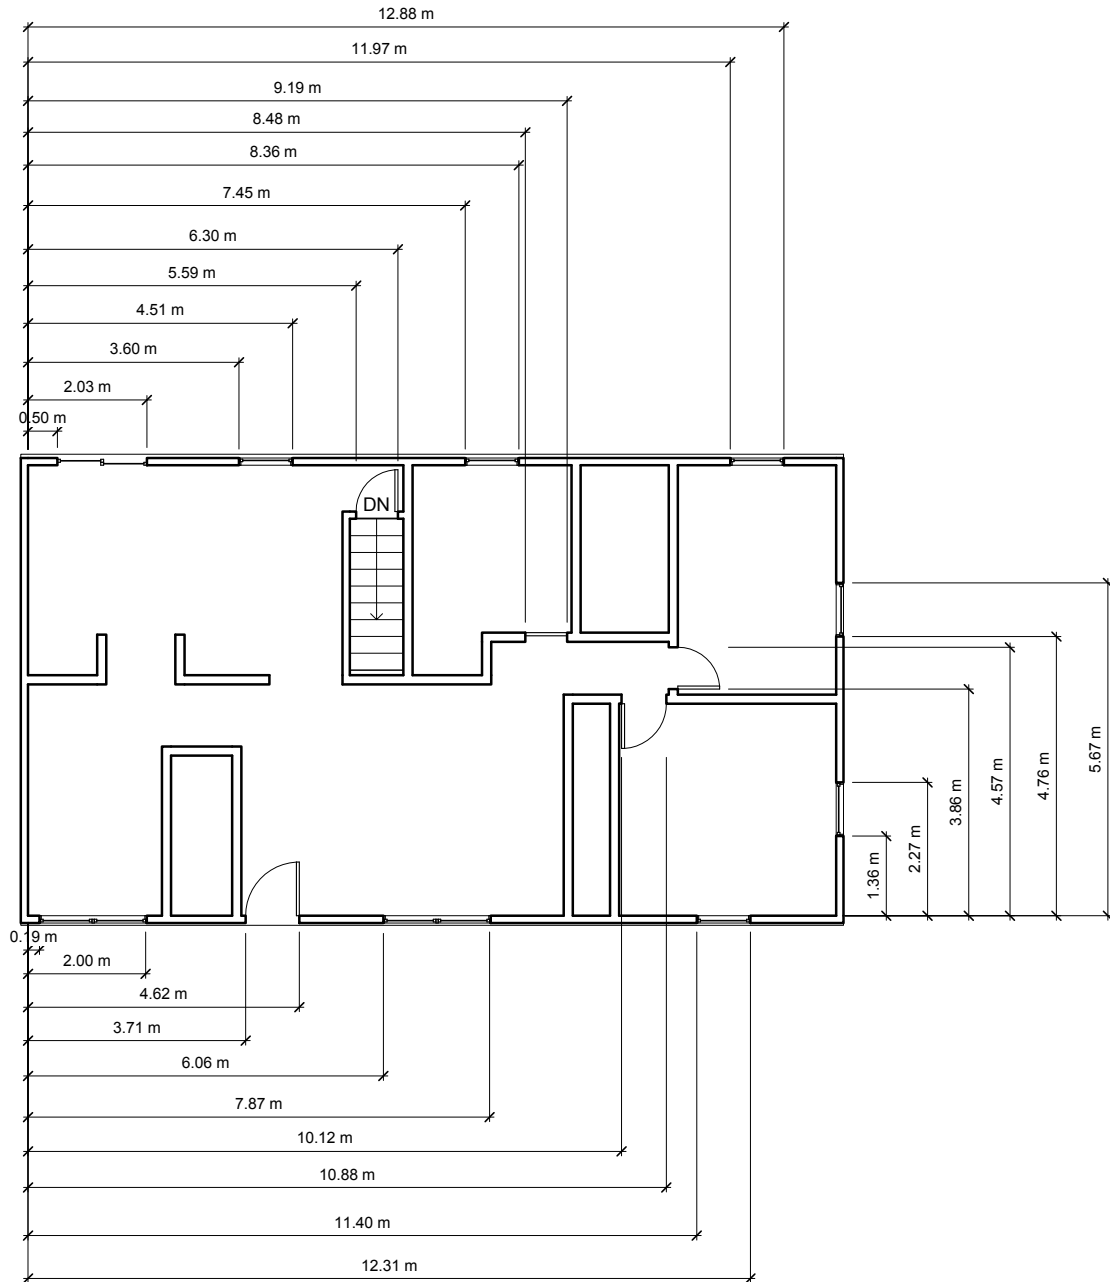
Fully Dimensioned Floor Plan of the First Floor Vent Locations
